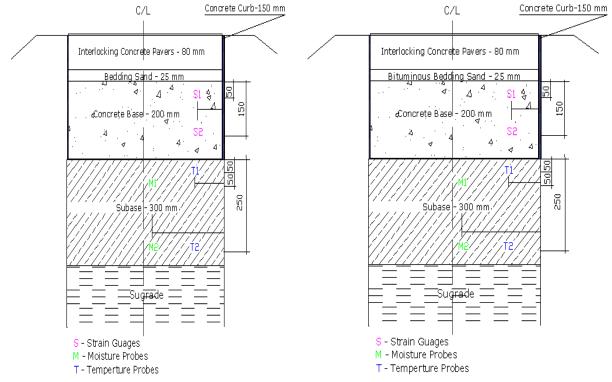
Profile View of Instrumented Crosswalk One and Two at UW Ring Road
